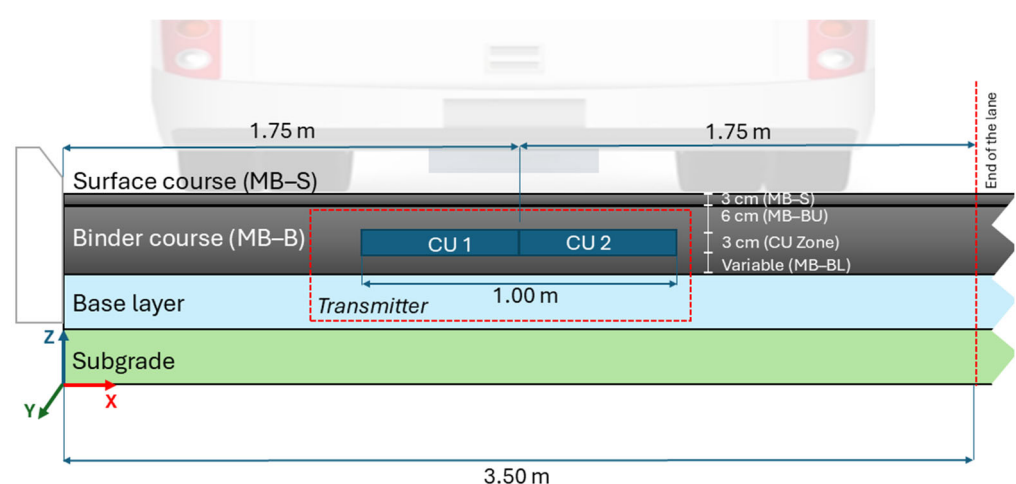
Cross-section of electrified pavement with embedded DWPT charging units (CUs).
